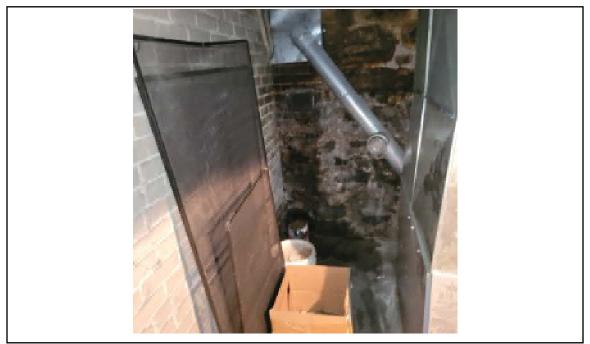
Main sanitary drain for 12 and 14 Hawthorne next to the brick dividing wall for 12/14 Hawthorne in basement of 12 Hawthorne.
